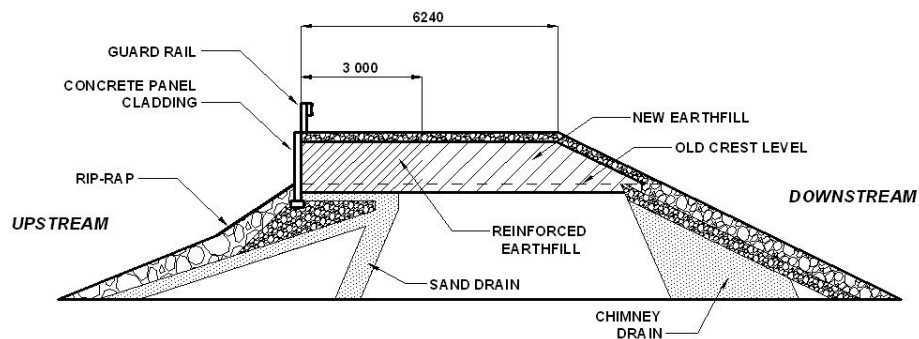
Vaalkop Dam: Typical Detail of MSE Crest
